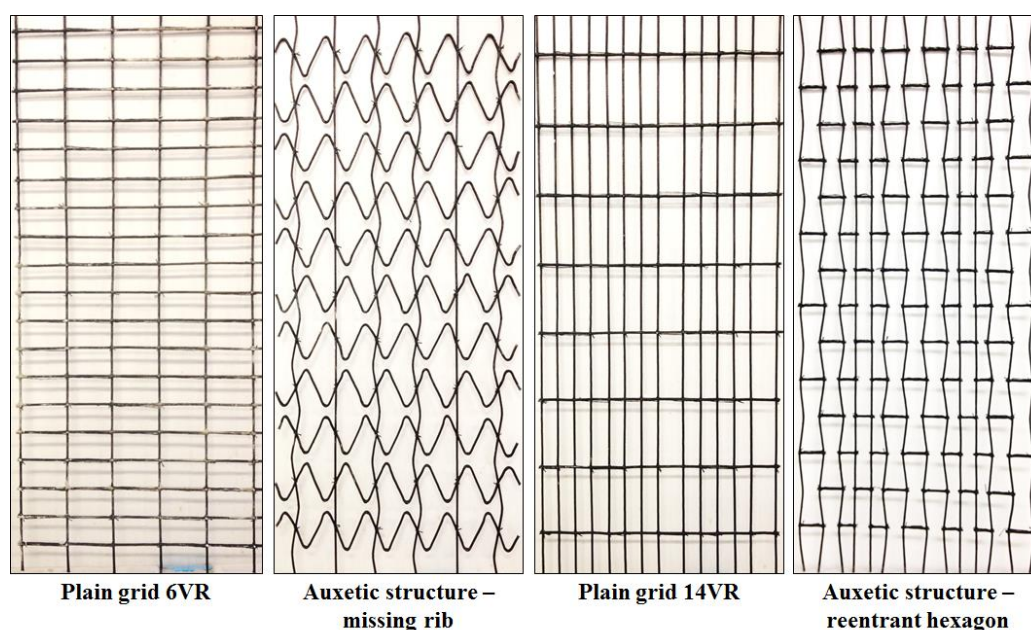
Braided composite structures used for masonry wall reinforcement. (6VR – six vertical rods and 14VR – fourteen vertical rods).
